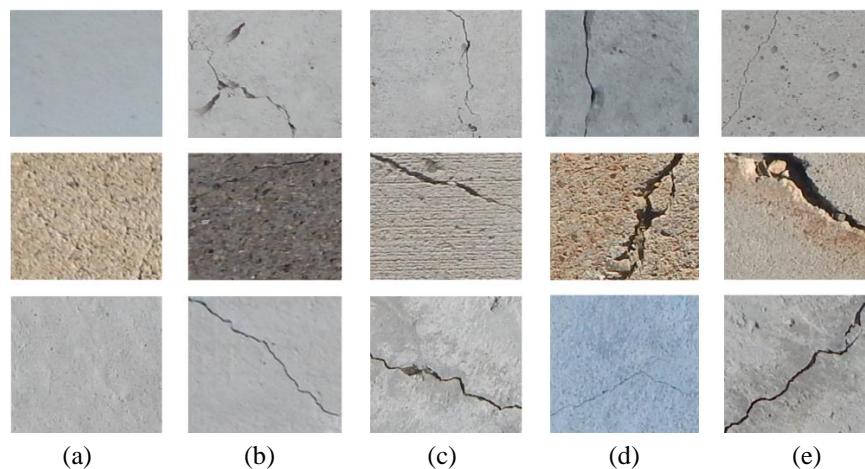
SDNET2018 image dataset: Non-cracked (a) and cracked (b-e) sample images with different crack widths and lighting conditions of walls (top row), pavements (middle row), and bridge decks (bottom row).
